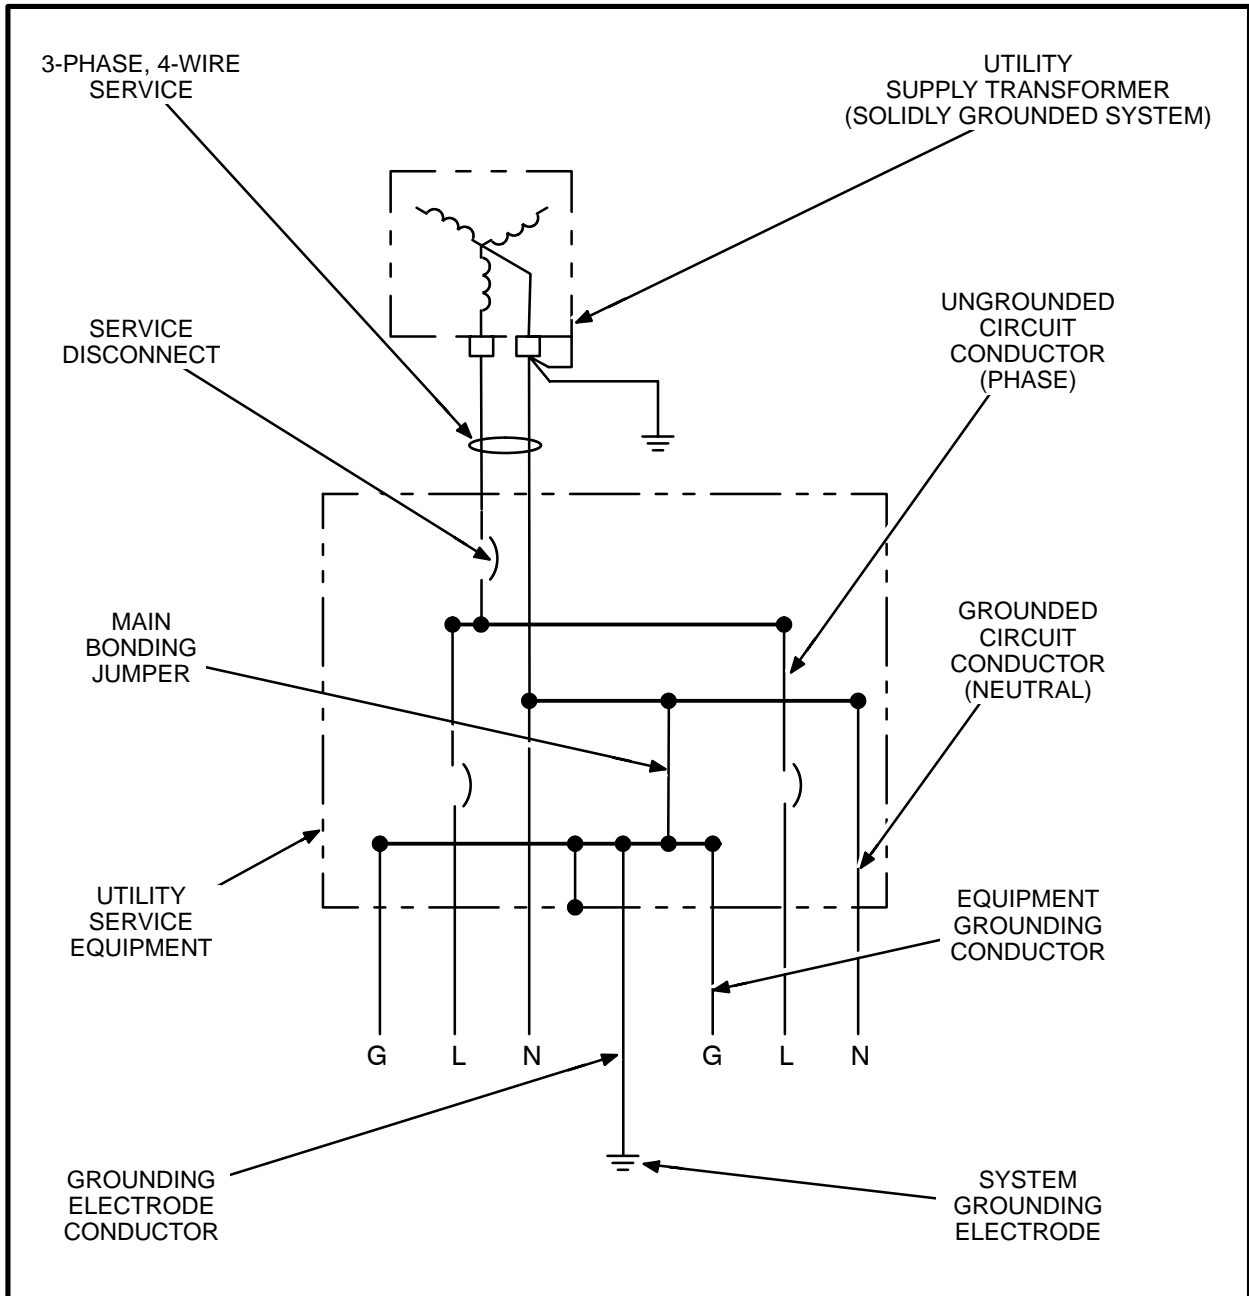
Typical System and Equipment Grounding Connections at the Utility Service Equipment
